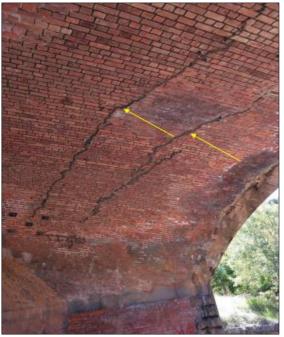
Longitudinal cracks along the arch soffit.9
